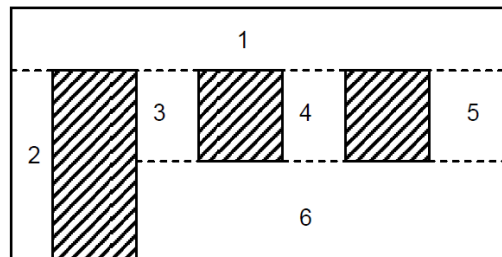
WALL WITH OPENINGS (CALCULATION OF RIGIDITY AND LOAD DISTRIBUTION)
